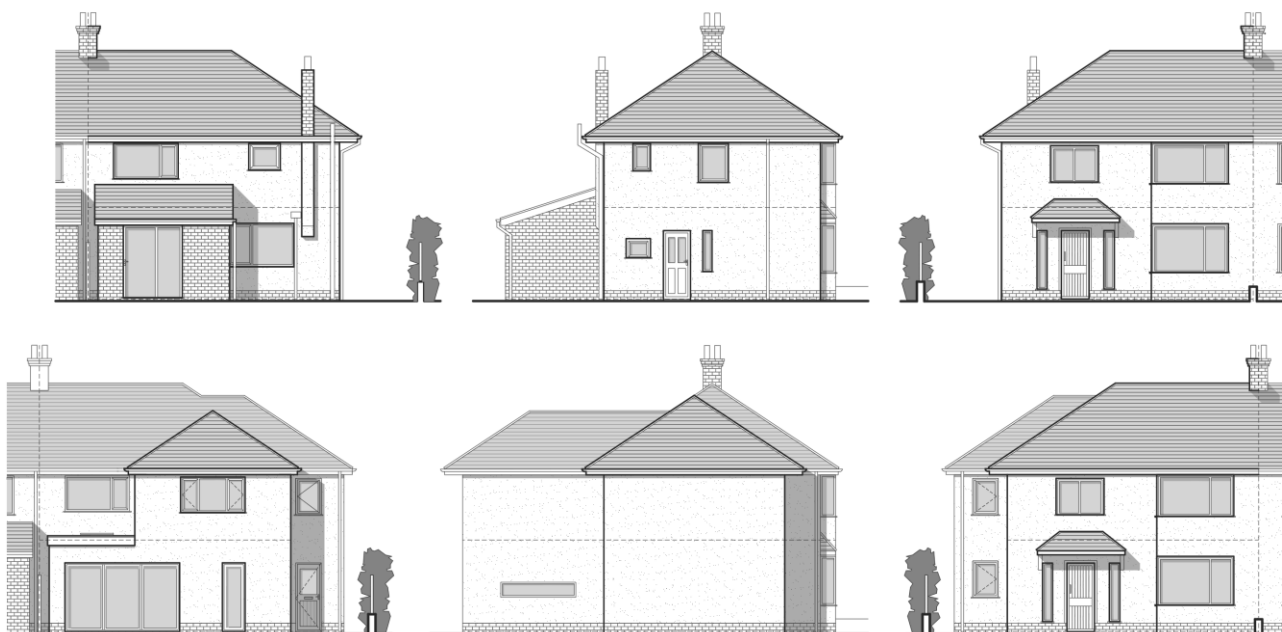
EXISTING AND PROPOSED ELEVATIONS
